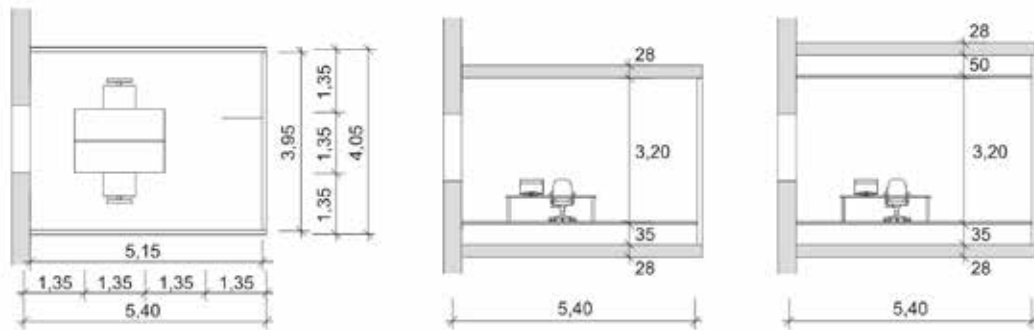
Standard room model: floor plan, side view, and side view with suspended ceiling (from left to right)
